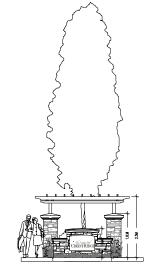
Concept Front Elevation A-A Typical Primary Gateway Feature
